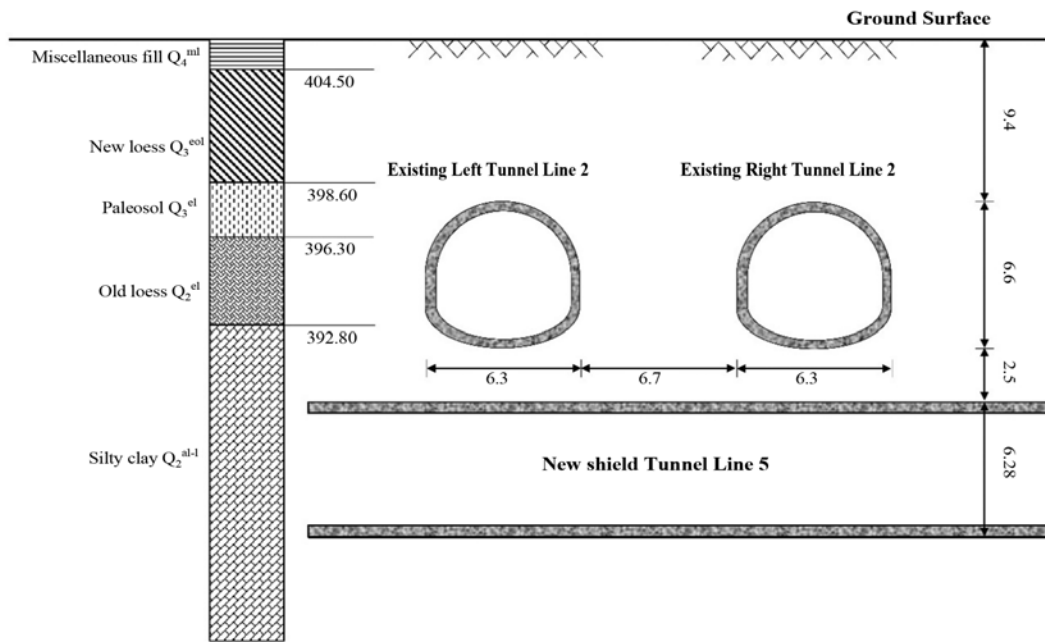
Profile of No. 5 Shield Tunnel Under-Crossing No. 2 Subway in Xi'an
